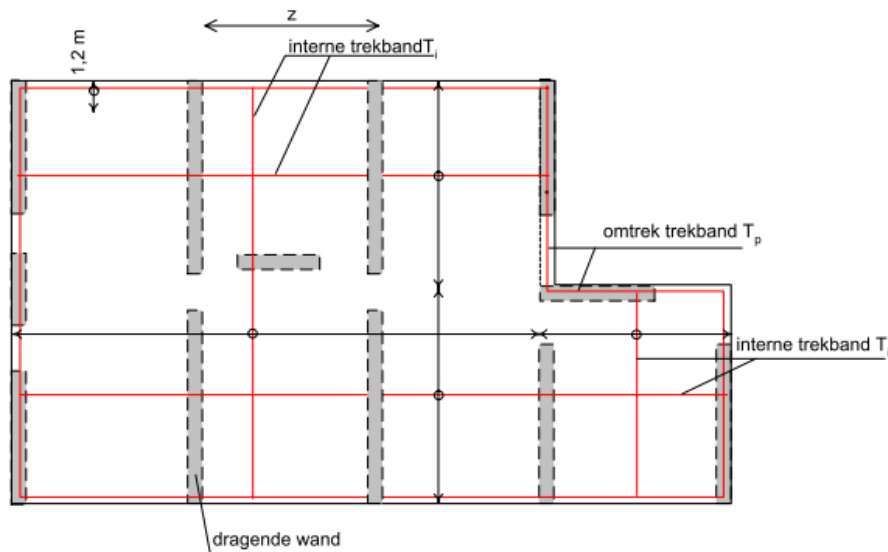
Example of horizontal tension ties for load bearing walls [Stufib 2006]
